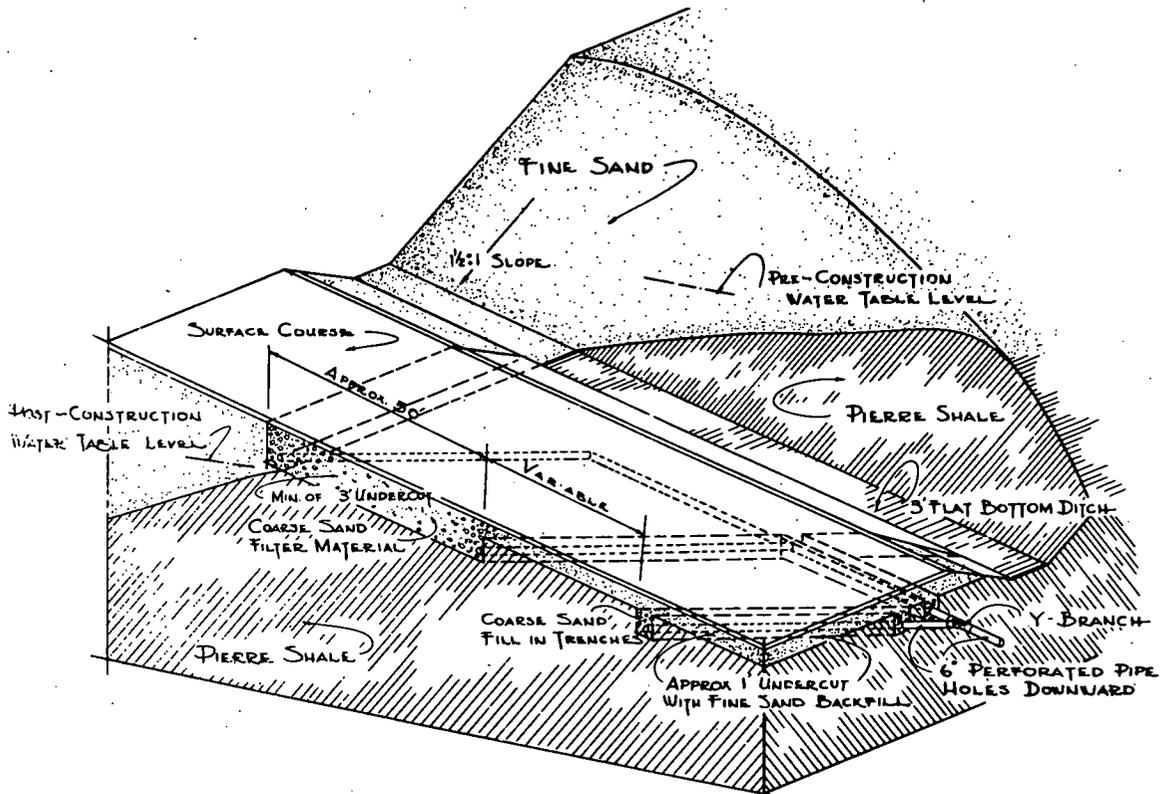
Subsurface Drainage Installation. Pictorial View of section taken at centerline showing left half of roadway. (After Lund)
